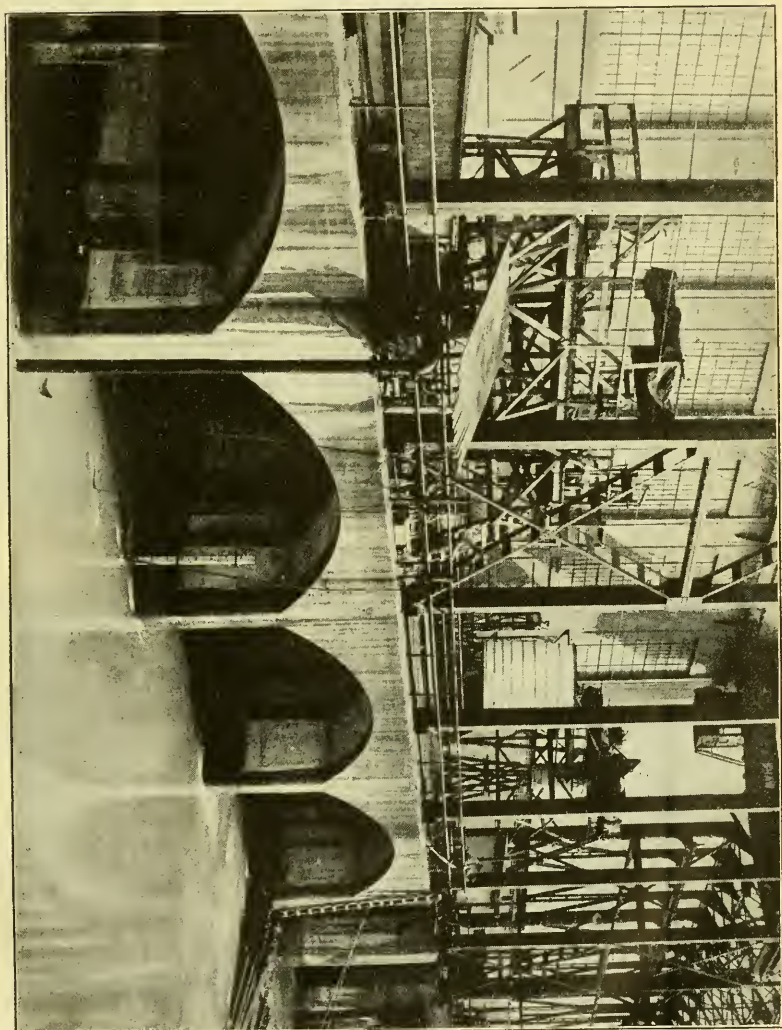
SALT-SOLUTION SYSTEM AND CURRENT-METER SUSPENSION FRAME FROM EAST BANK OF CANAL.
